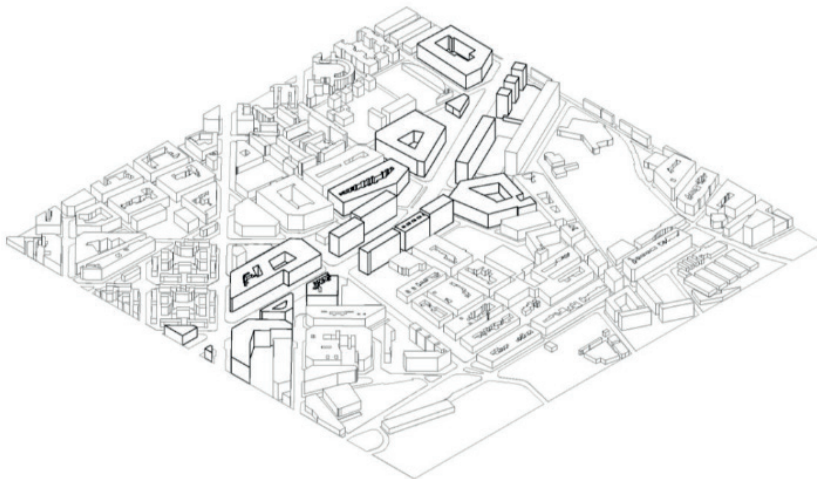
isometric site plan (Drawings by the author based on the project documents)
